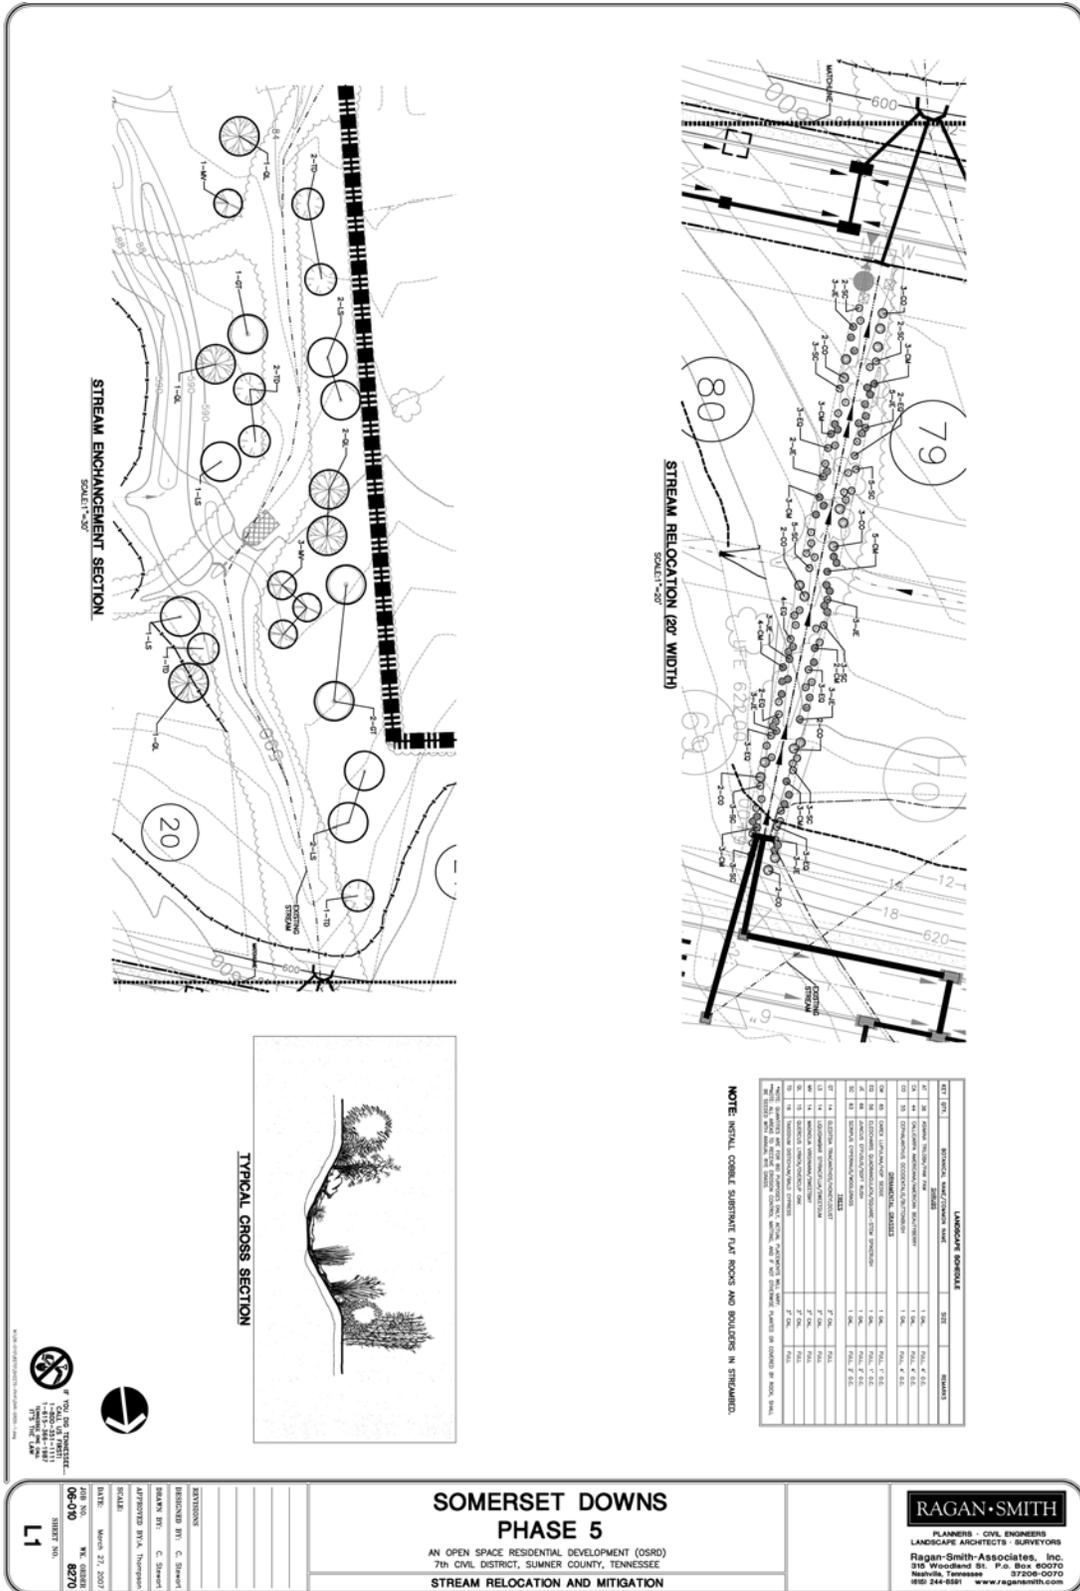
Showing final plan for upper section of stream alterations and planting scheme
